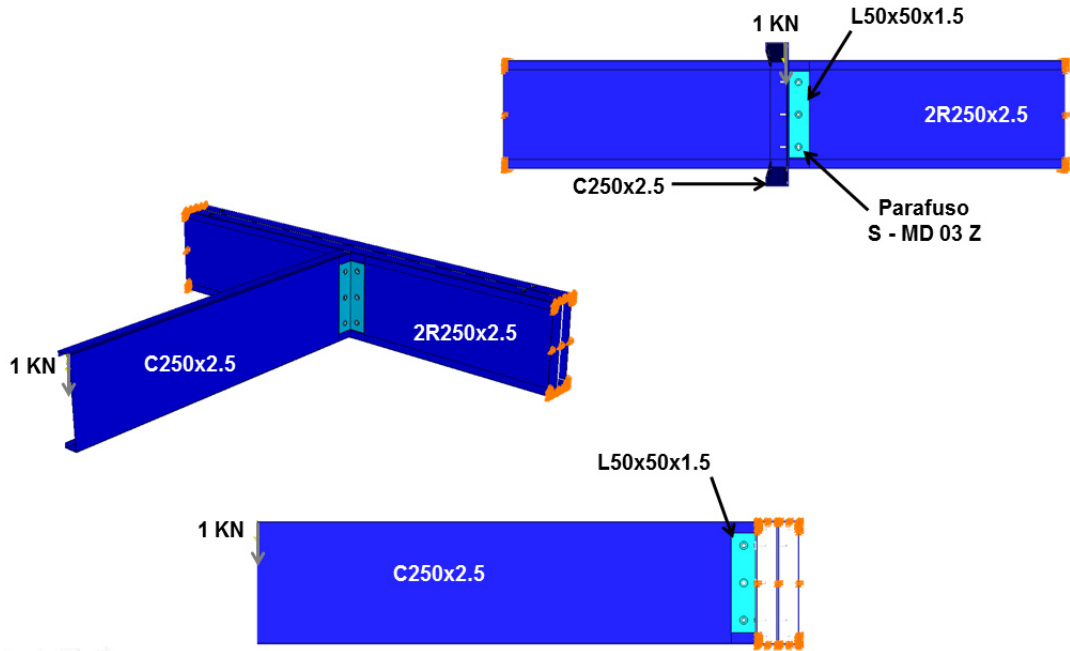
Views of a connection between a C beam and a 2R beam (connection C_1)
